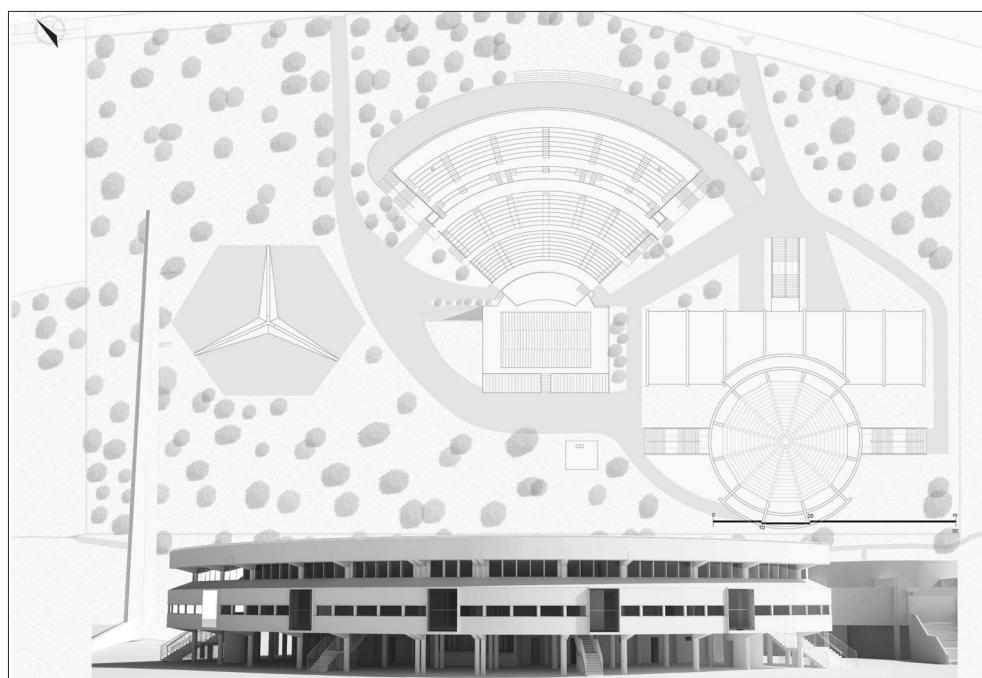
ELEVATION OF THE GROUND FLOOR AND OF THE MAIN FAÇADE. *Image: I. Adrakta, 2014.
